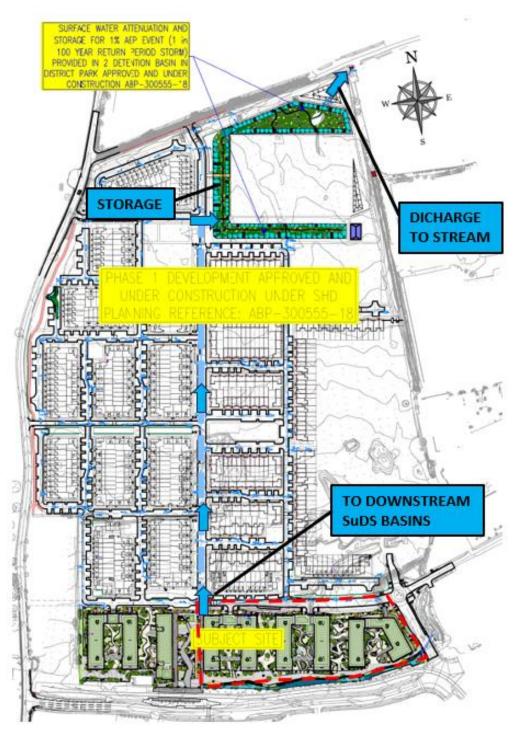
Overview of Stormwater drainage Conveyance Plan
